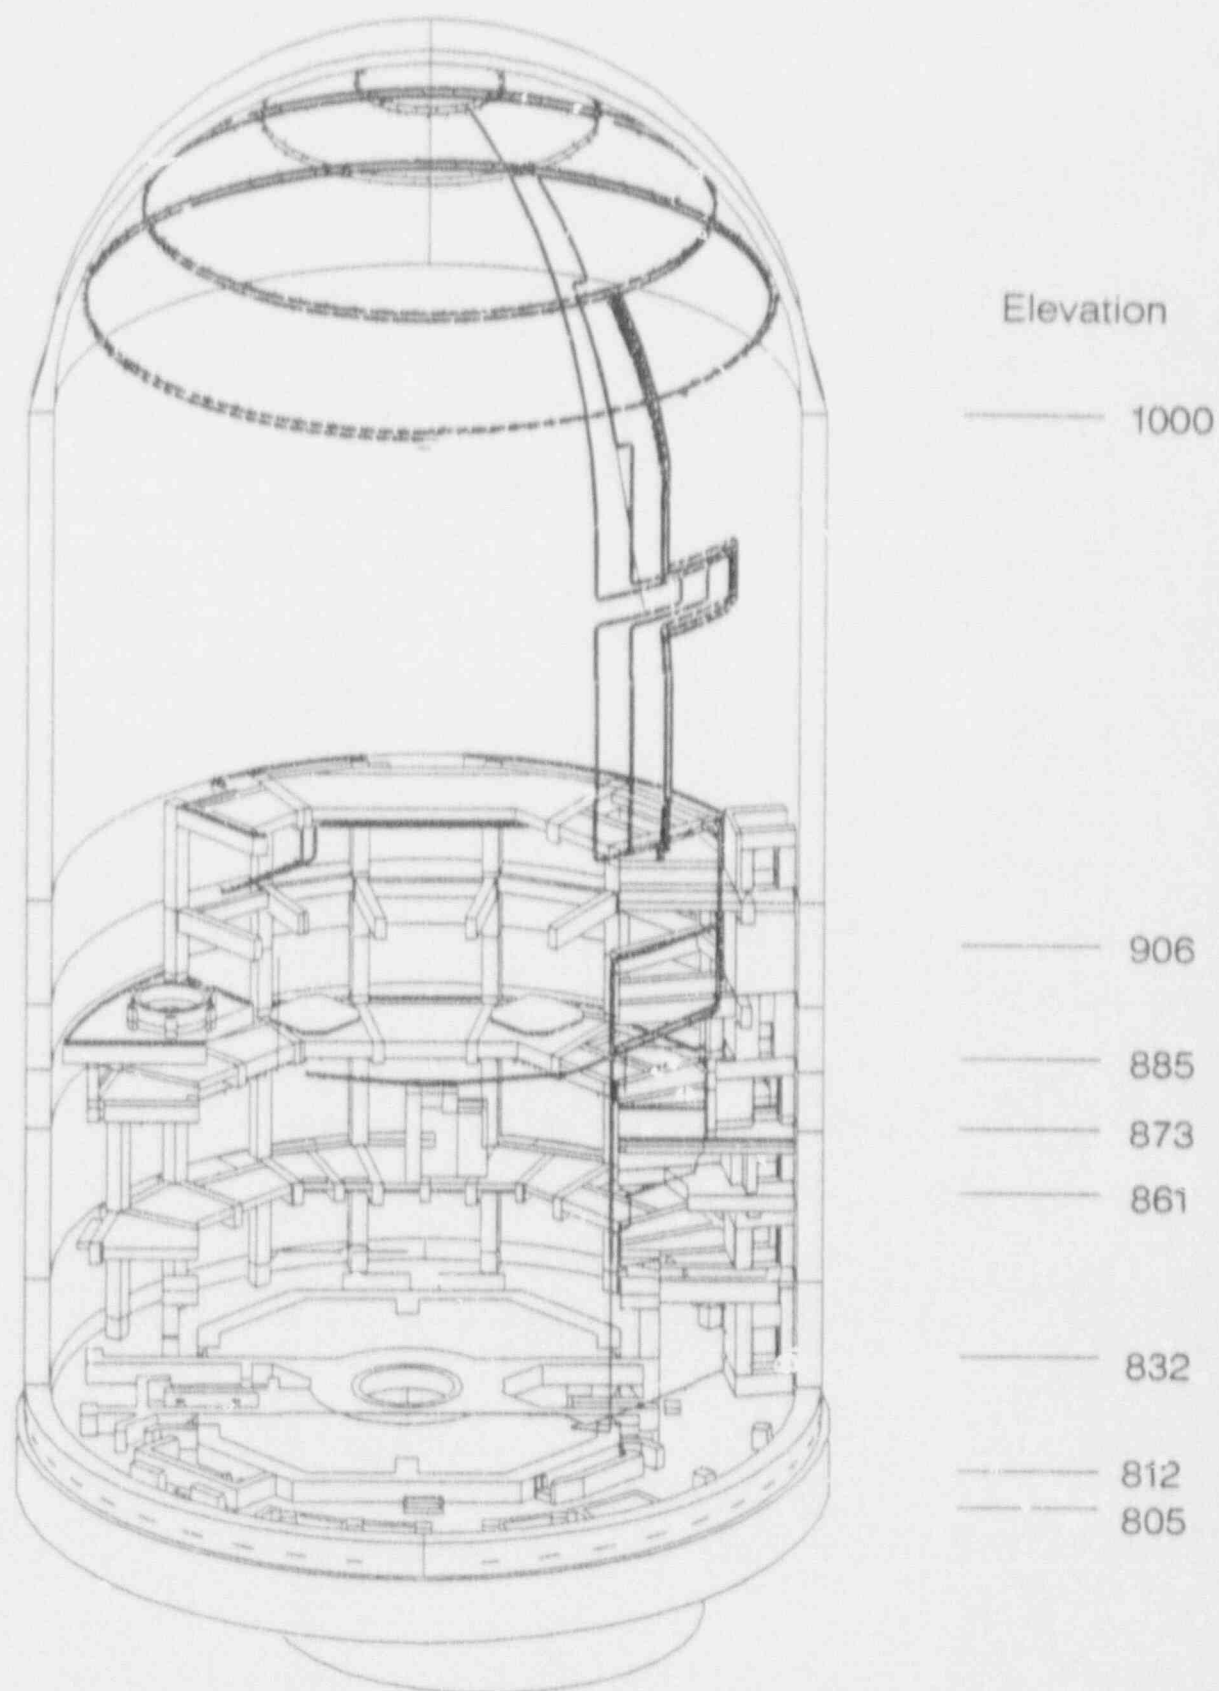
Containment Sump Piping and Arrangement (Structural View)
